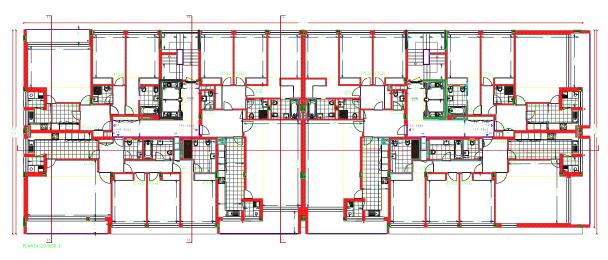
Floor architectural plan (CIVI4, 2015).
